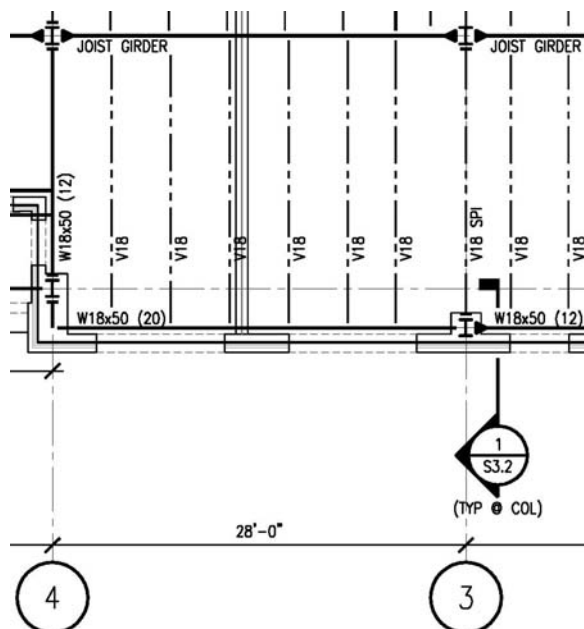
Plan Detail showing typical bay examined for gravity loading.
